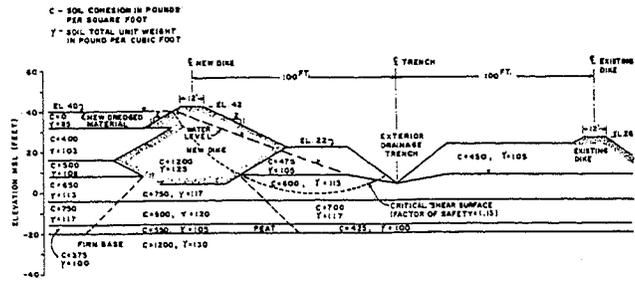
SOIL PROFILE AND DIKE STABILITY-STAGE 2
